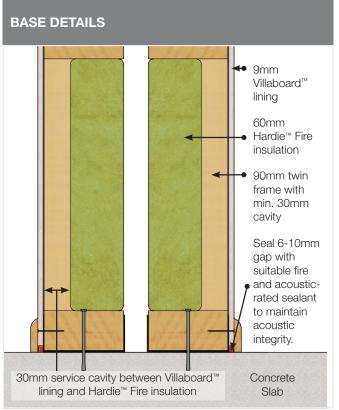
HARDIE™ SMART INTERTENANCY WALL SYSTEM BASE TO SLAB DETAIL
